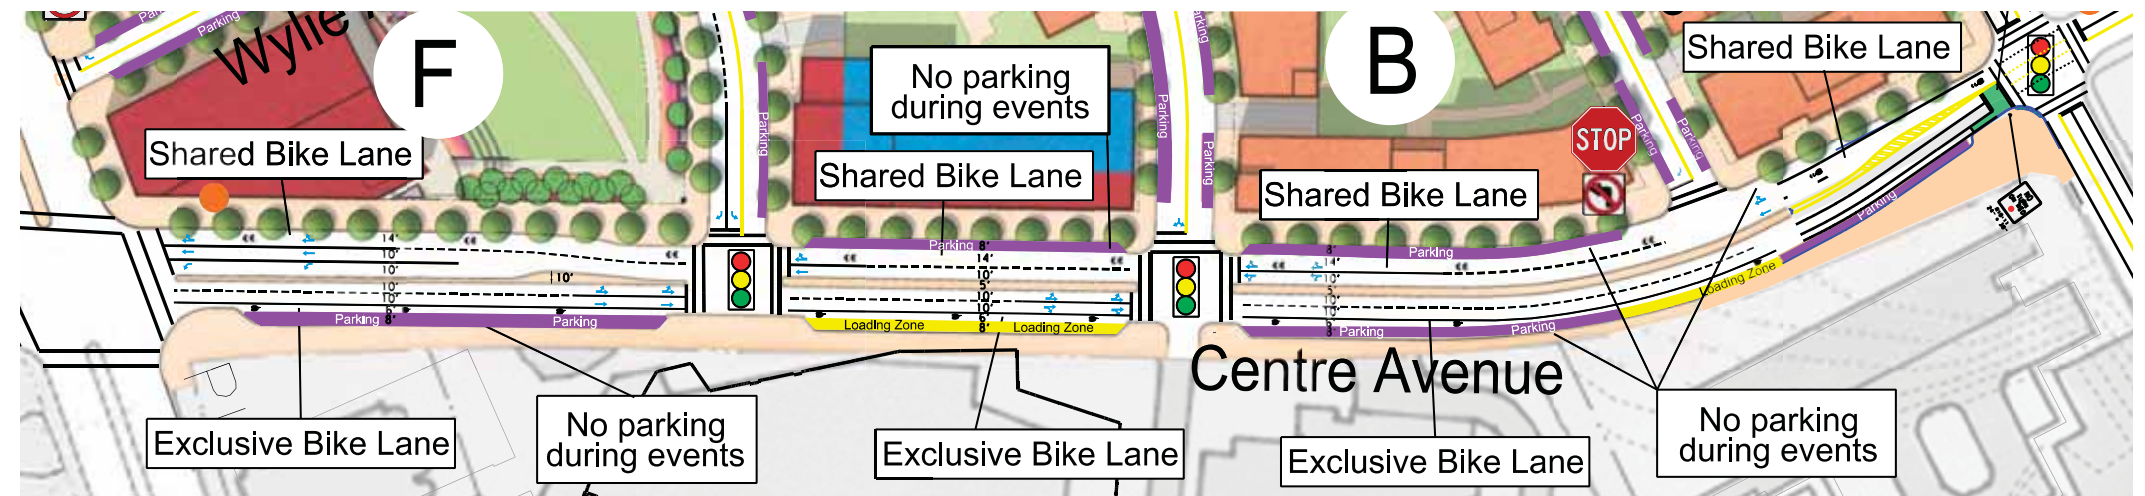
Centre Avenue Roadway Configuration and Recommended Improvements
